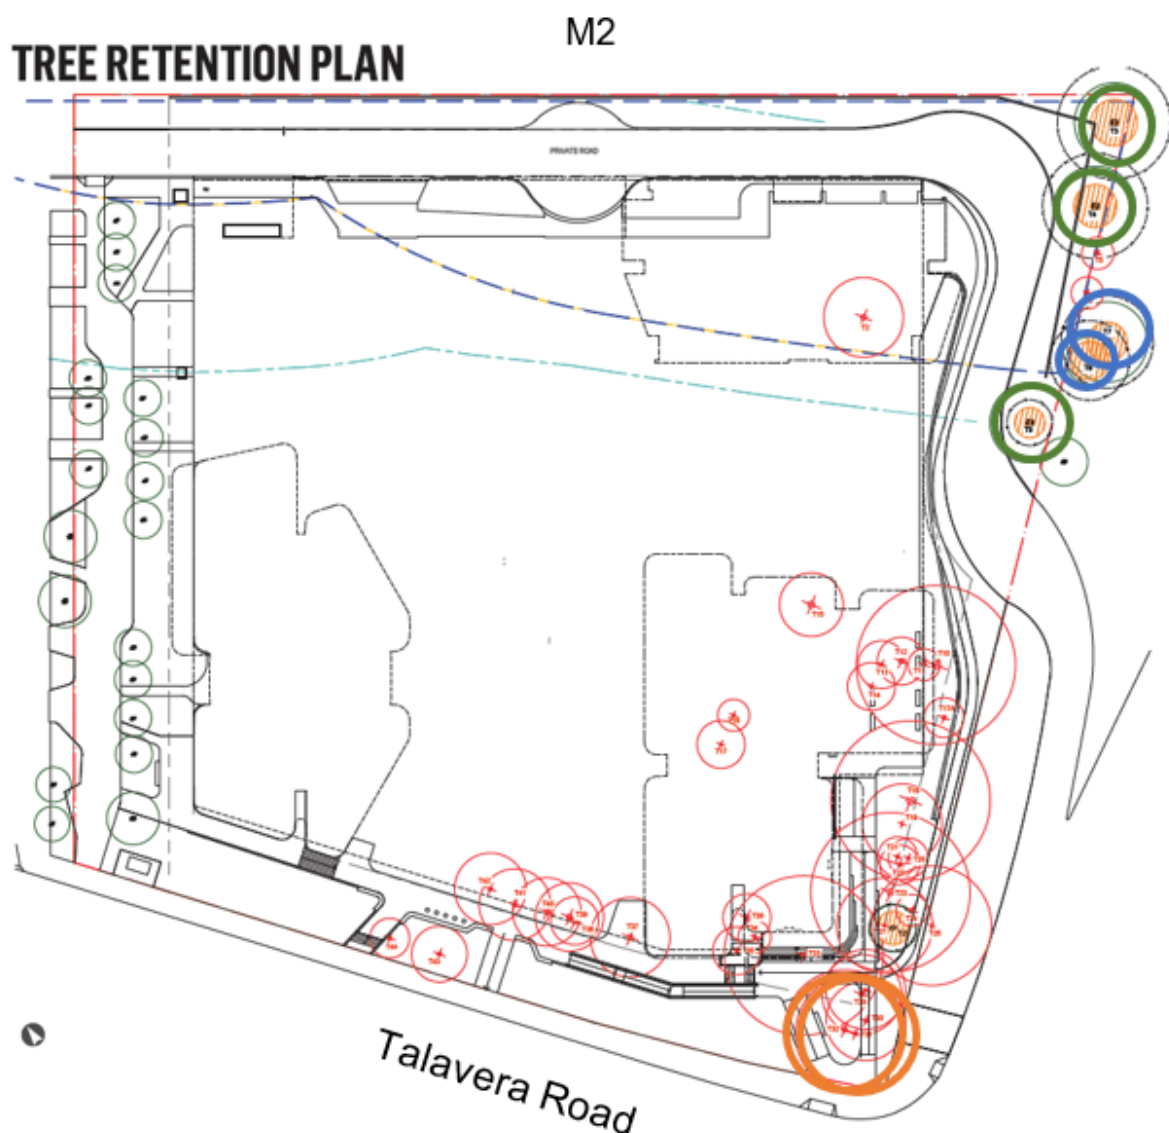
Site Plan indicating trees proposed to be retained on site by the applicant in green.
